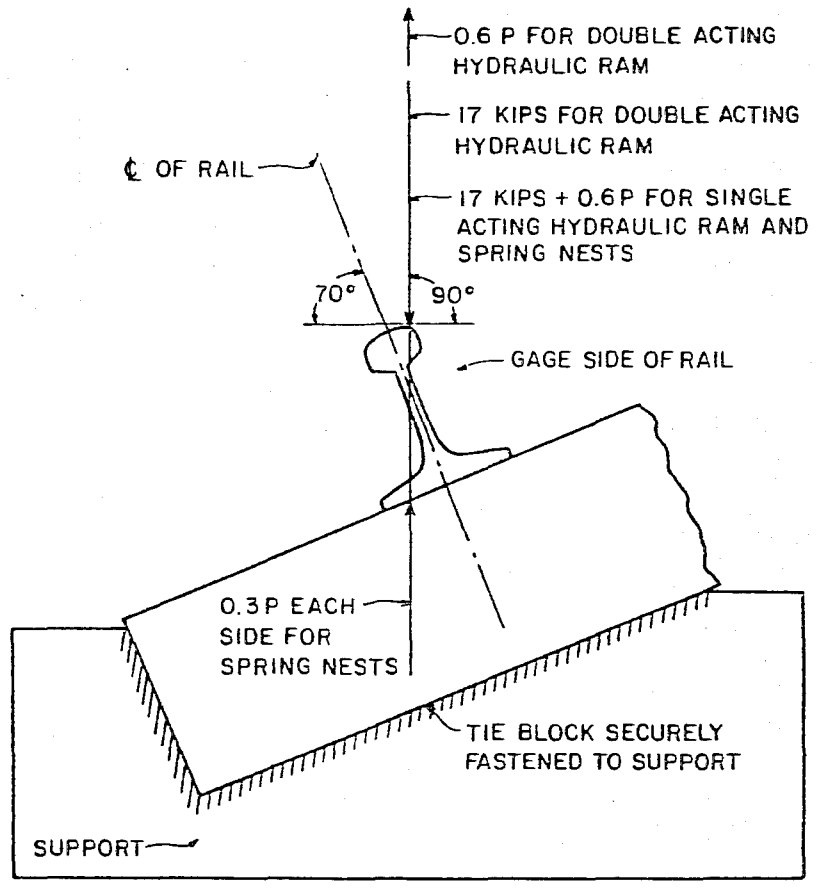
RAIL FASTENING REPEATED LOAD TEST
